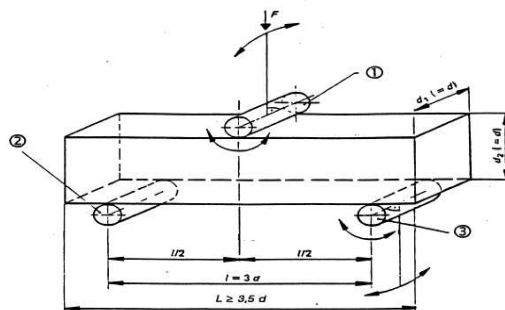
Arrangement of loading of test specimen, centre-point loading (British Standards Institution, 2004).
